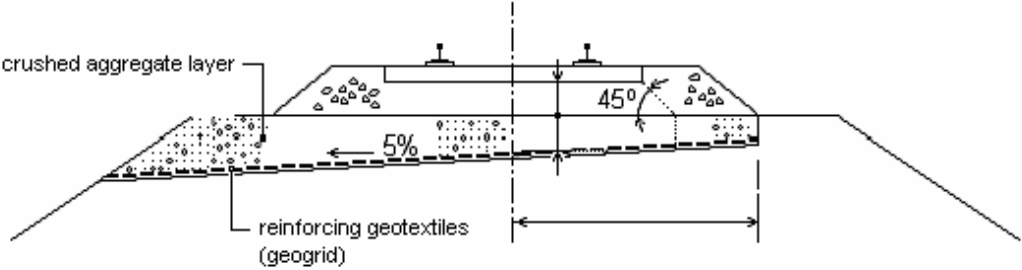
Use of reinforcing geotextiles in the railway embankment (INNTRACK)
